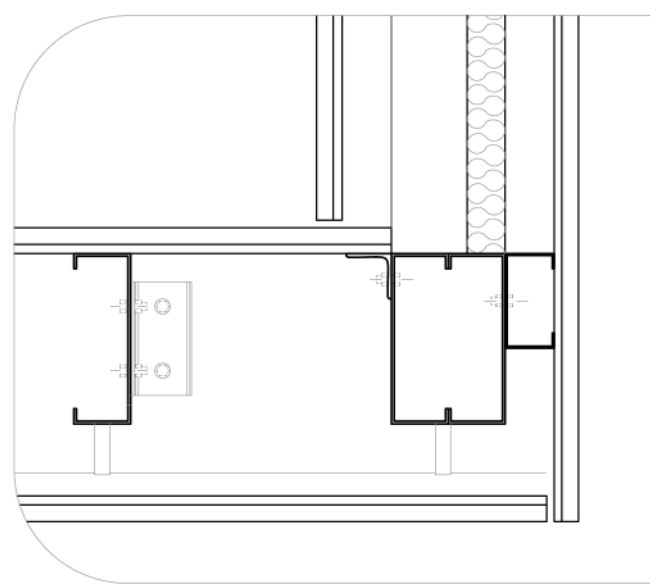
Secondary structure load tracing digital rendering indicating connection between vierendeel truss and lipped channels onto which the timber founge and groove boards are fastened.
